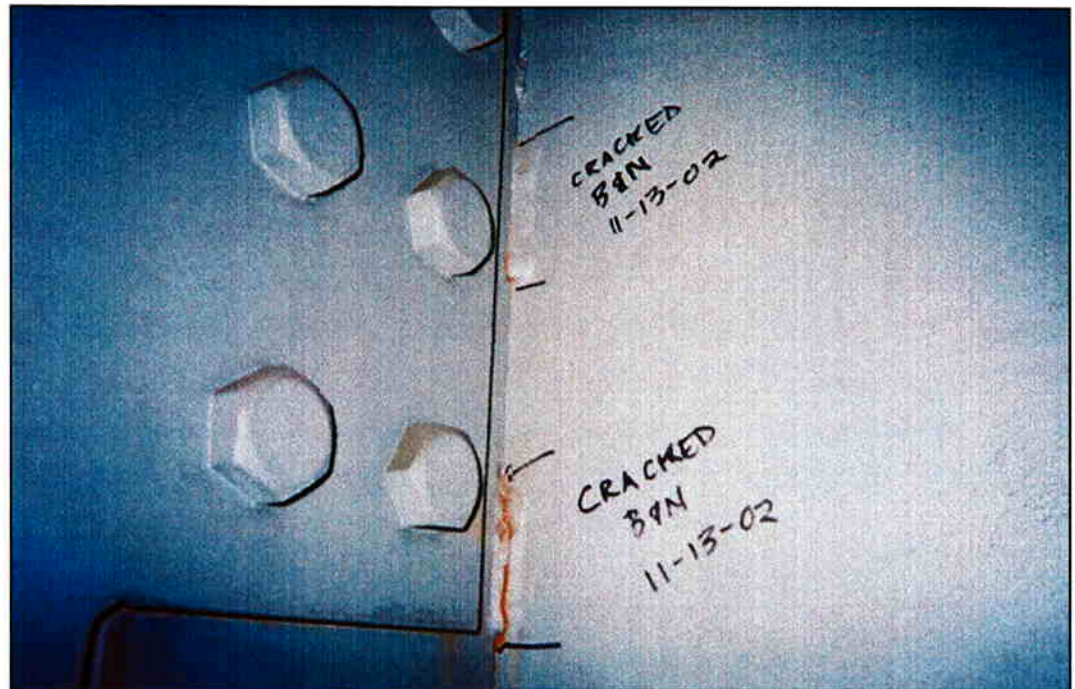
Looking north at stiffener on west face of girder 5, northern line of diaphragms between Piers LD11 and LD12. Note full length cracks in welds with fretting corrosion.
